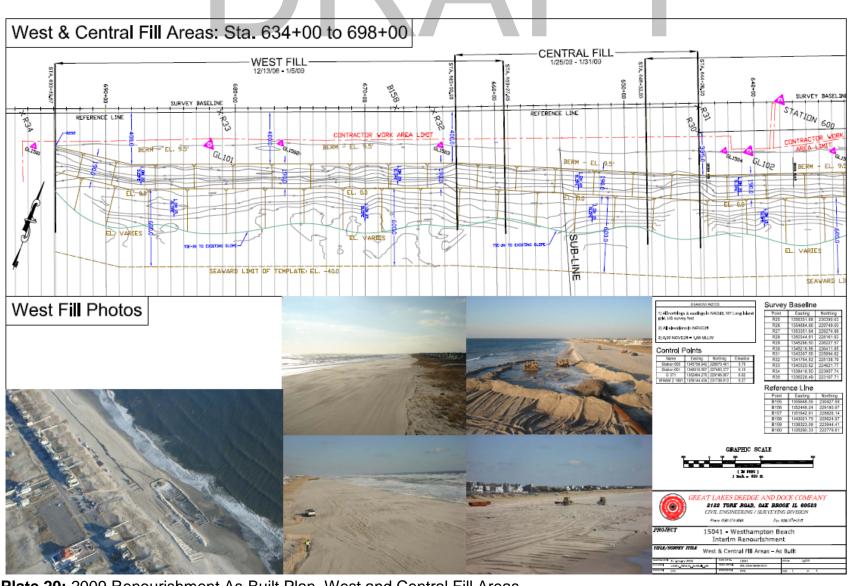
2009 Renourishment As-Built Plan, West and Central Fill Areas
